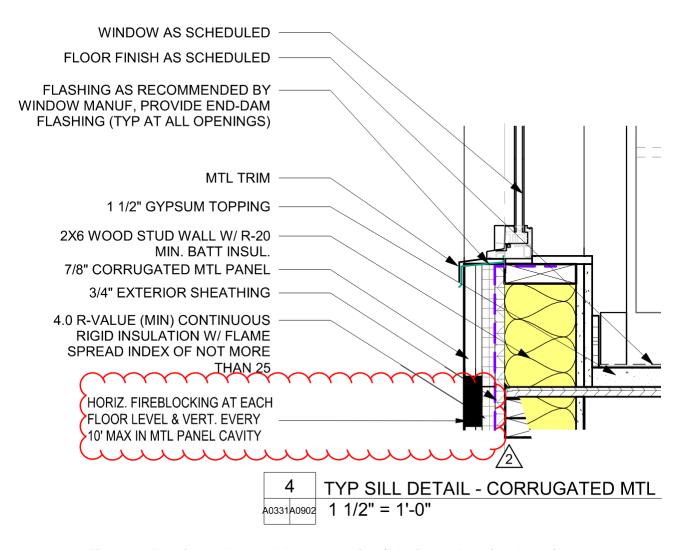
Exterior wall assembly construction (Detail 4 on Drawing A0902)
